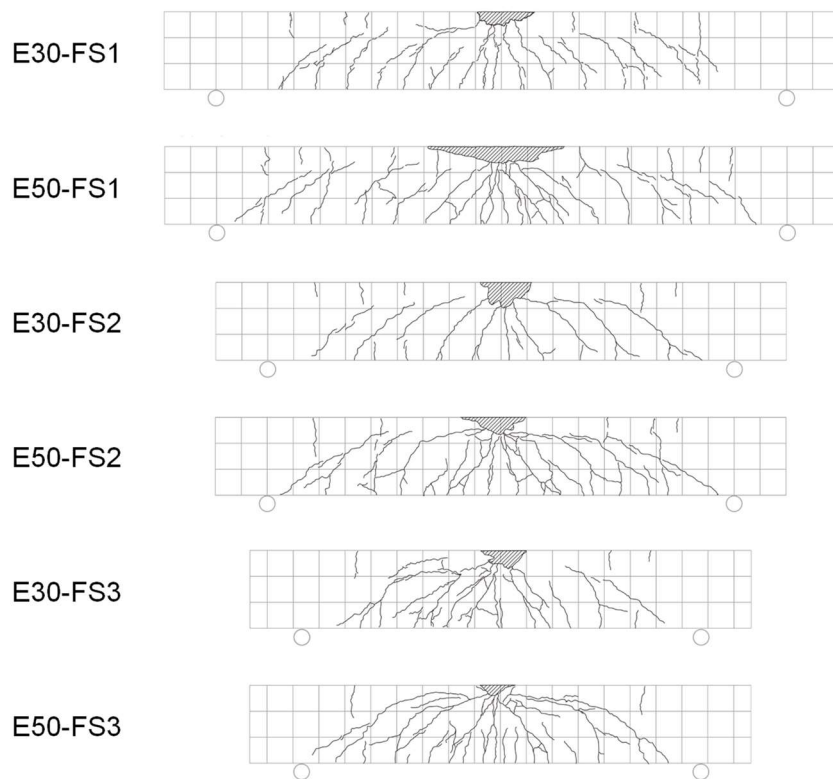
Crack patterns of RC beams (Ahn, 2021)
